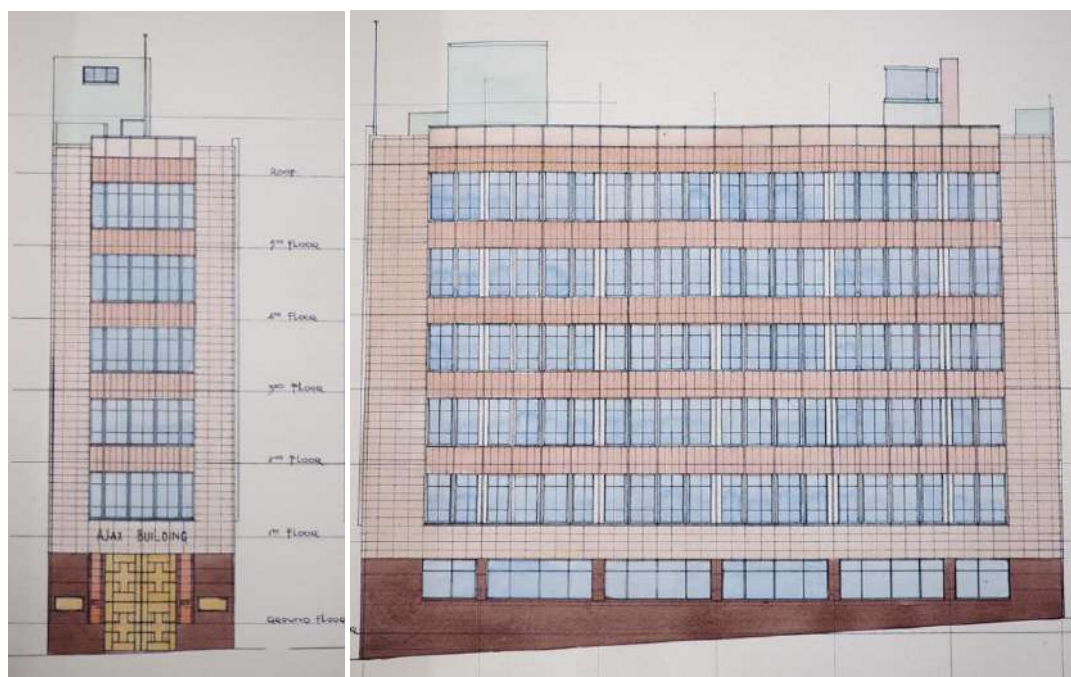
Original plans from 1955, showing the tile-clad Queen Street elevation (left) and Little Collins elevation (right) of the subject building at 103-105 Queen Street. (Source: PROV VPRS 11200/P7 unit 1066)
